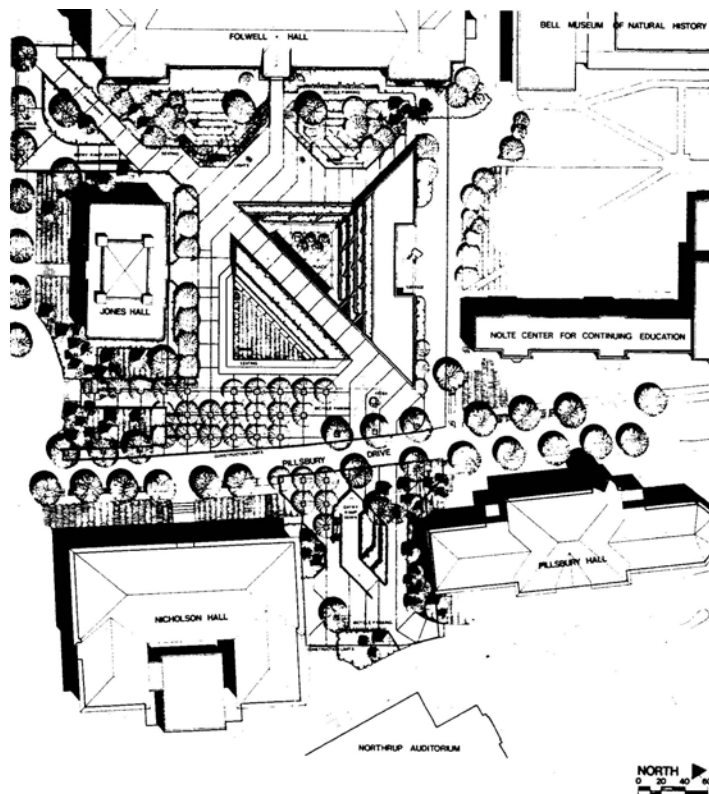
Williamson Hall site plan showing the new building and original existing historic buildings.
